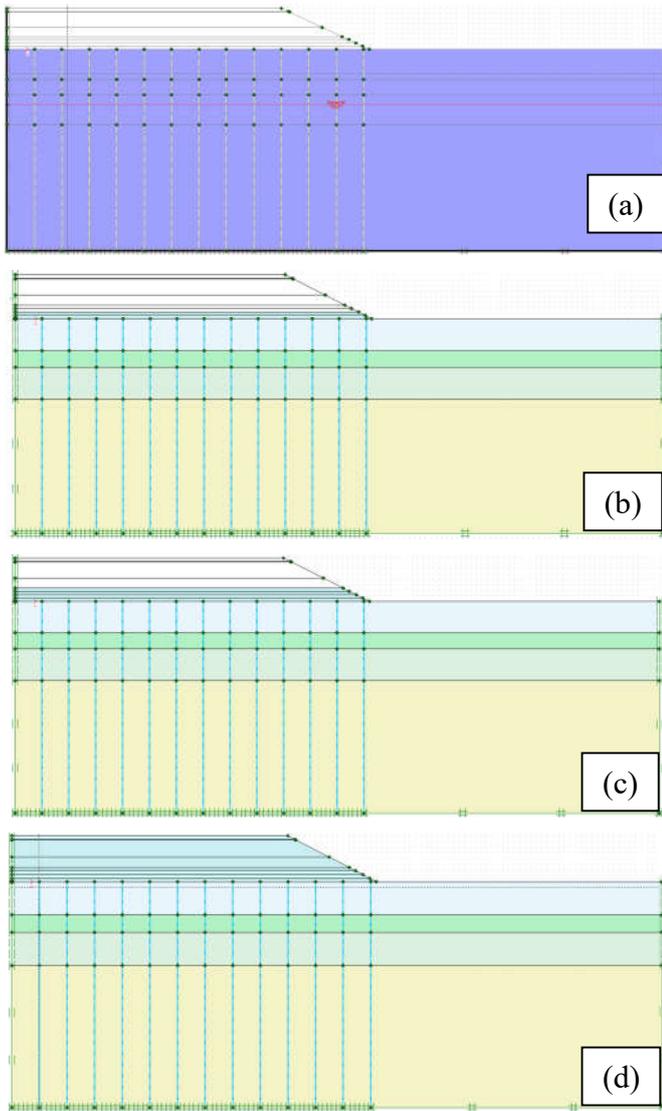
Staged constructions representing the progressive development of the preload embankment (a) Installation of PVDs (b) Embankment filling up to a height of 0.6 m (c) Embankment filling up to a height of 1.23 m (d) Full height embankment filling
